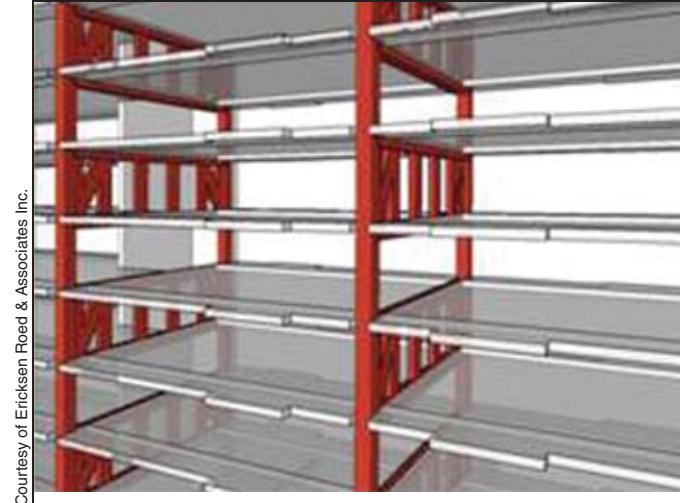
This rendering of a 3-D schematic reveals column-free alternating floors provided by the new ER-POST system. The building industry needed alternatives to the conventional post-tensioned and precast concrete beams and columns so that owners could have the flexibility and openness necessary for a multiuse design.
